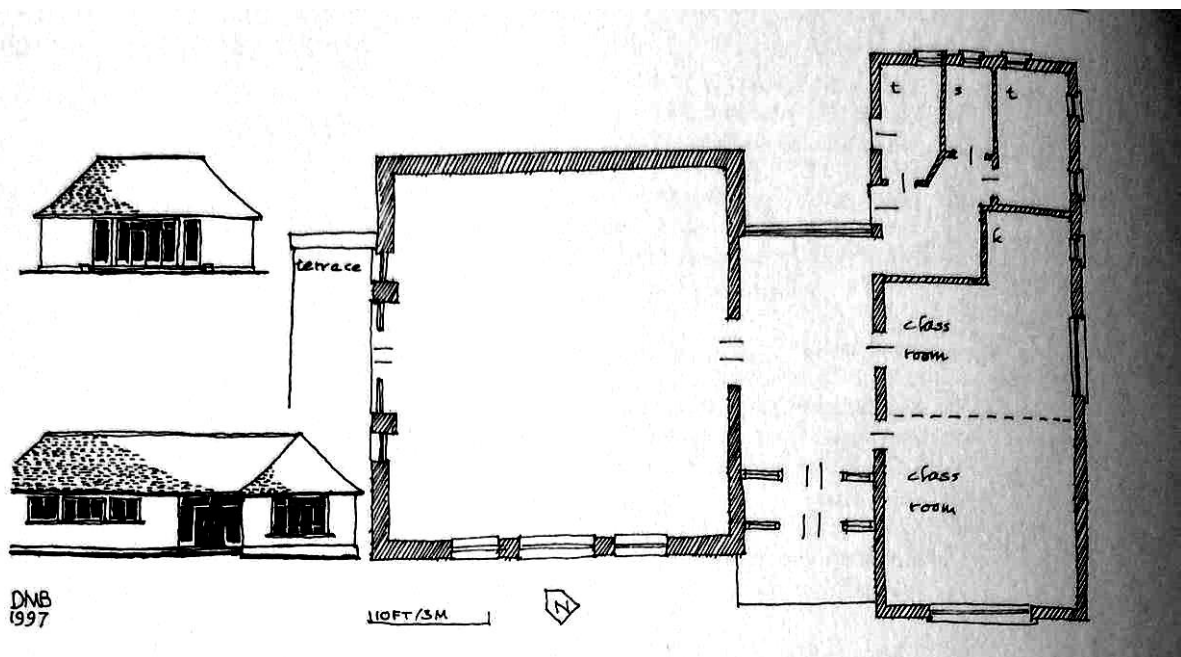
Plan and elevations of present building, from Butler, Vol. 1, p.278
